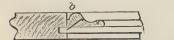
Incorrect Way of Nailing Moulding in Panels.
